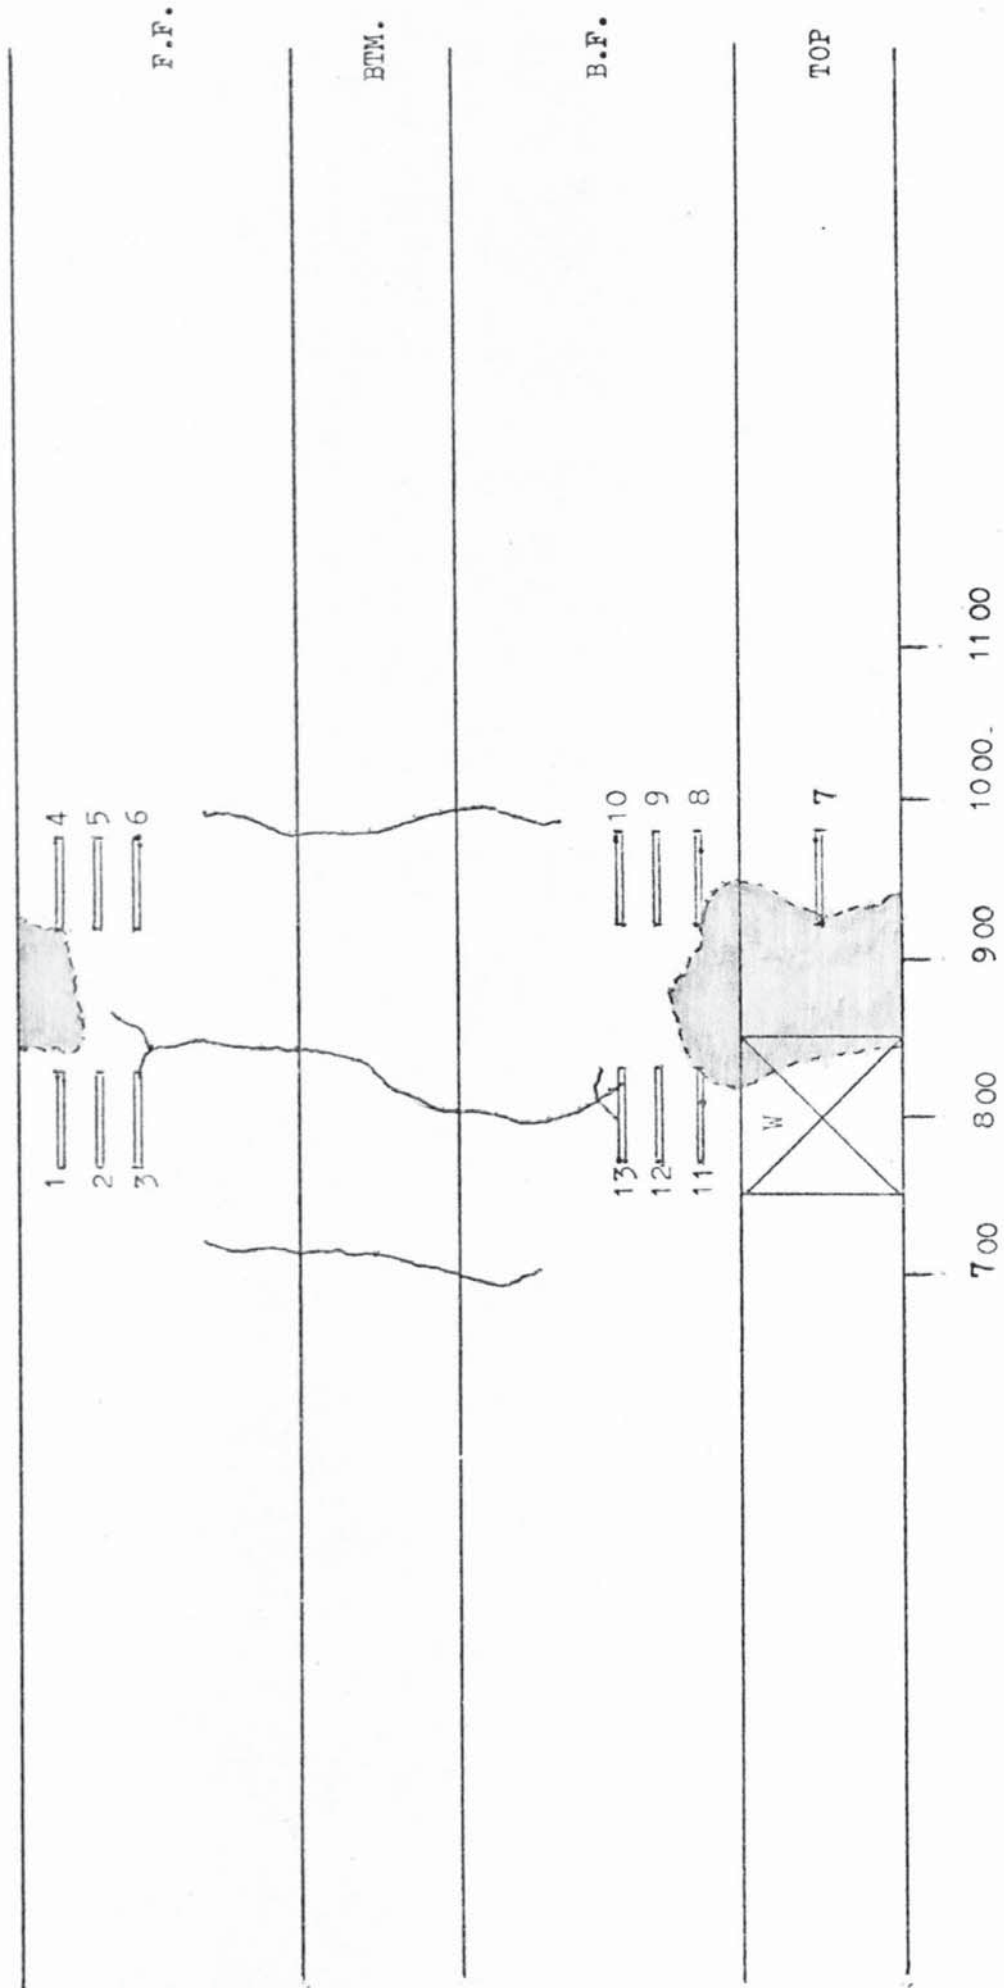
FAILURE CRACK PATTERNS - BEAM 13 (MODE 1)
